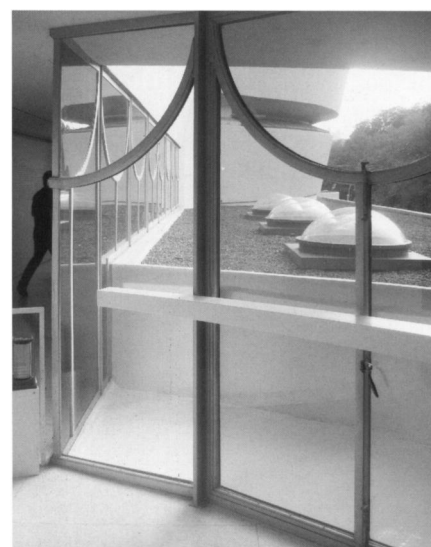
Interior view of new thermally broken steel-frame glass walls installed on the third floor, photograph 2009.
